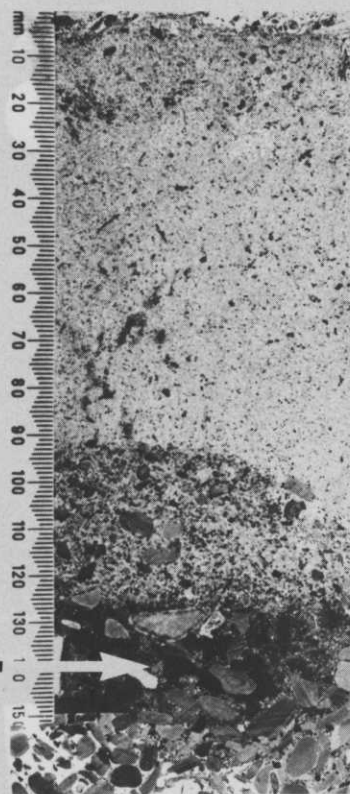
A cross section of a poorly built sand carpet construction. Soil has been pushed over clean gravel in a slit drain beneath the sand carpet (see arrow) destroying the vital drainage connection of the slit drain with the sand carpet
